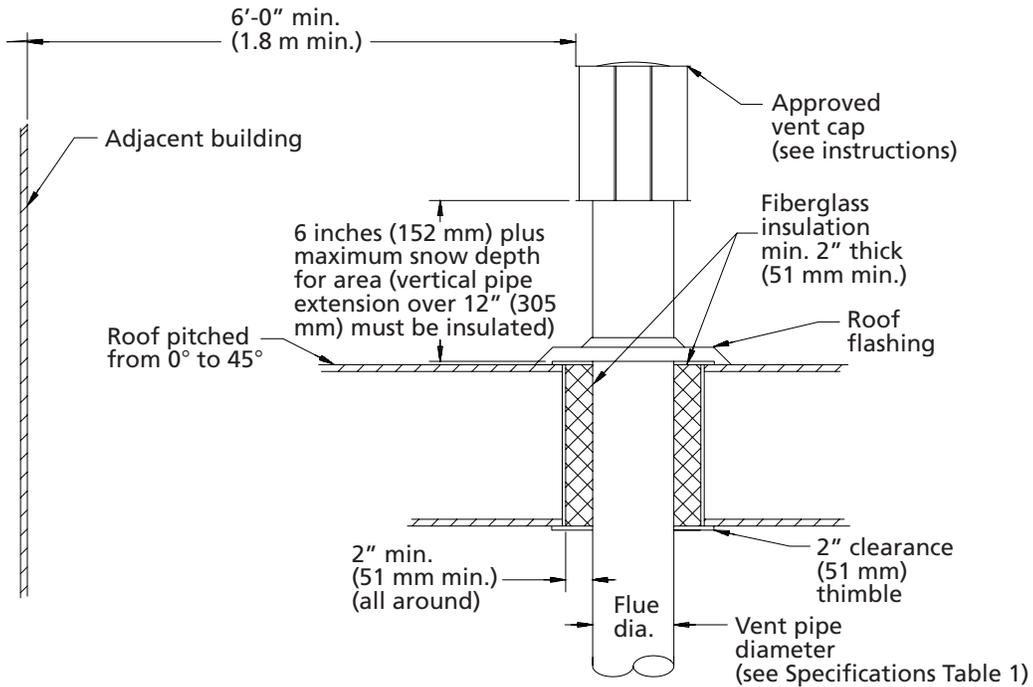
B – Vertical Arrangement – Single Wall Vent System to Single Wall Termination
